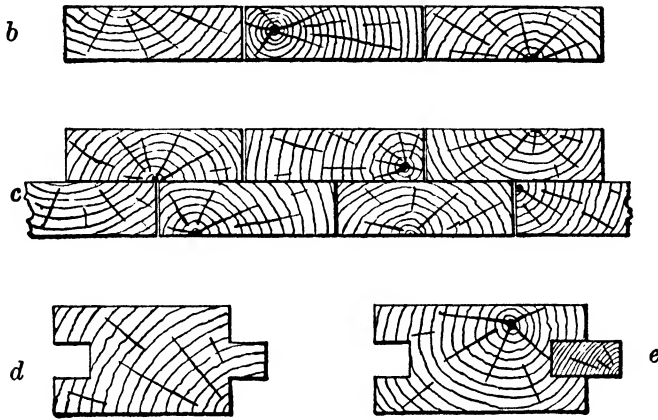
Wakefield or Triple-lap Timber Sheet Piling.
